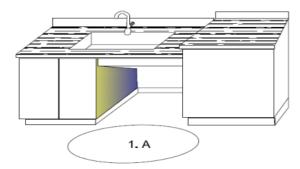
Details of the kitchen sink (Mutfak lavabo detayı)
